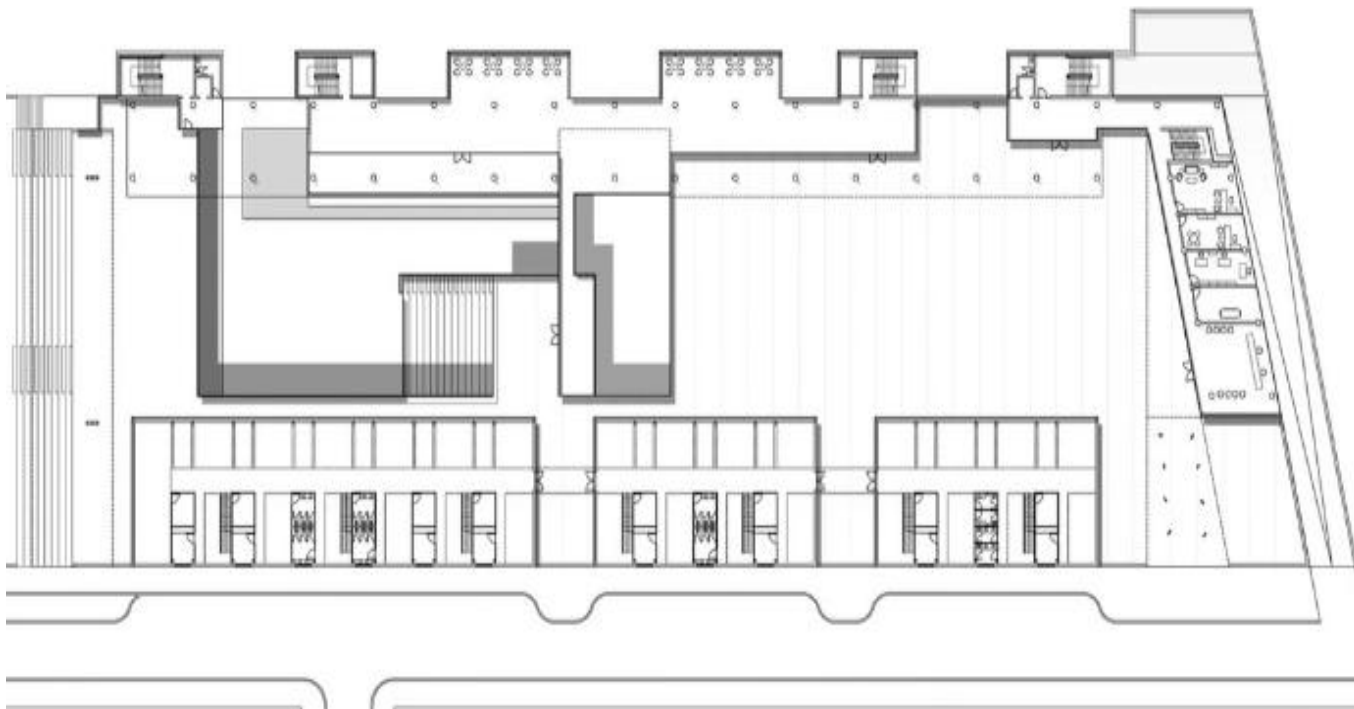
First Floor Plan Source: archdaily.com (2022)
